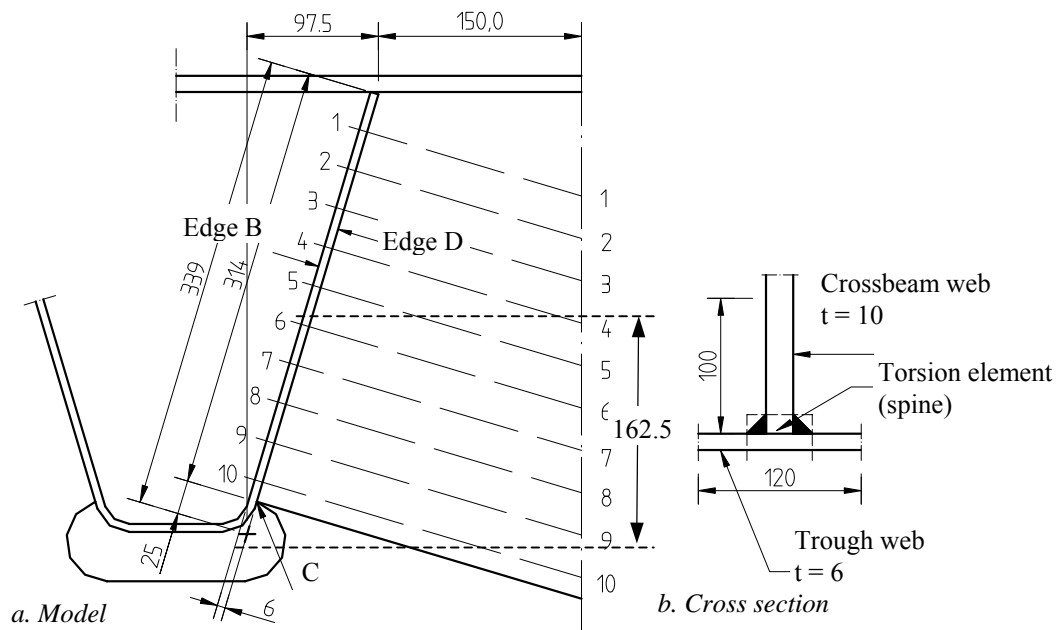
Trough web to crossbeam web connection (dimensions in mm)
